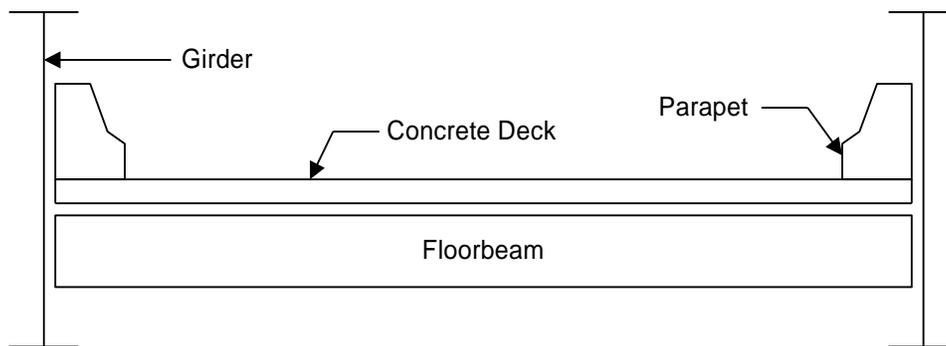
Schematic Cross Section of a Girder-Floorbeam Steel Bridge
